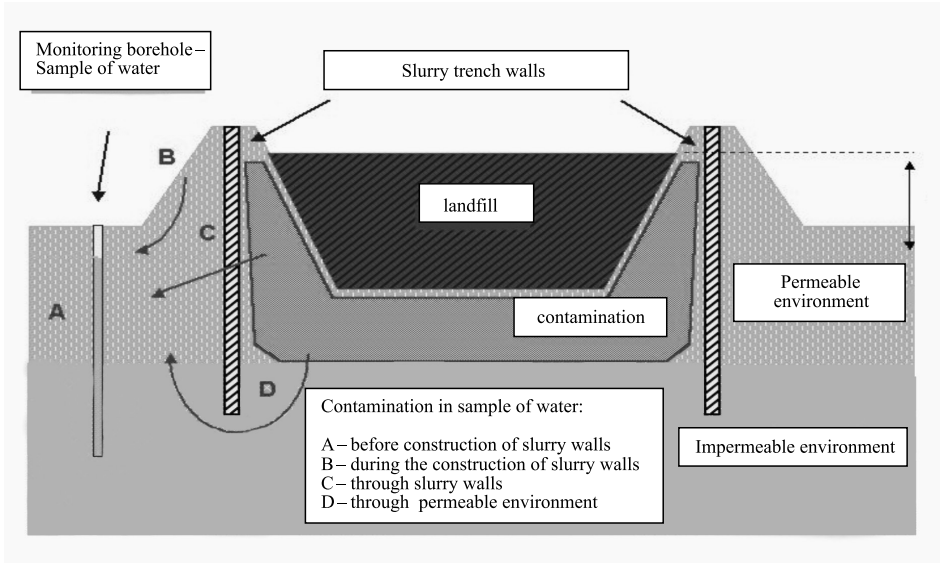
Model of landfill encapsulated by slurry trench walls.
